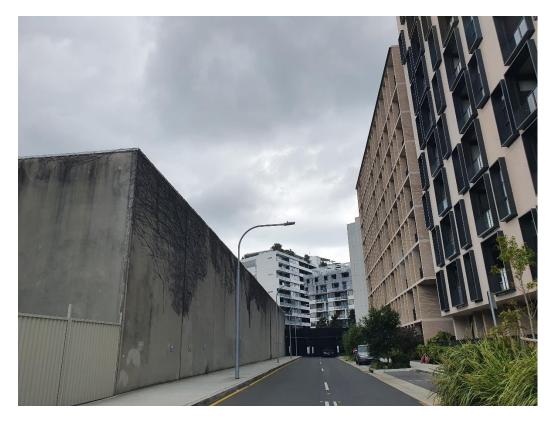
South of site (black fenced) viewed from Kingsborough Way which is to extend through subject site
